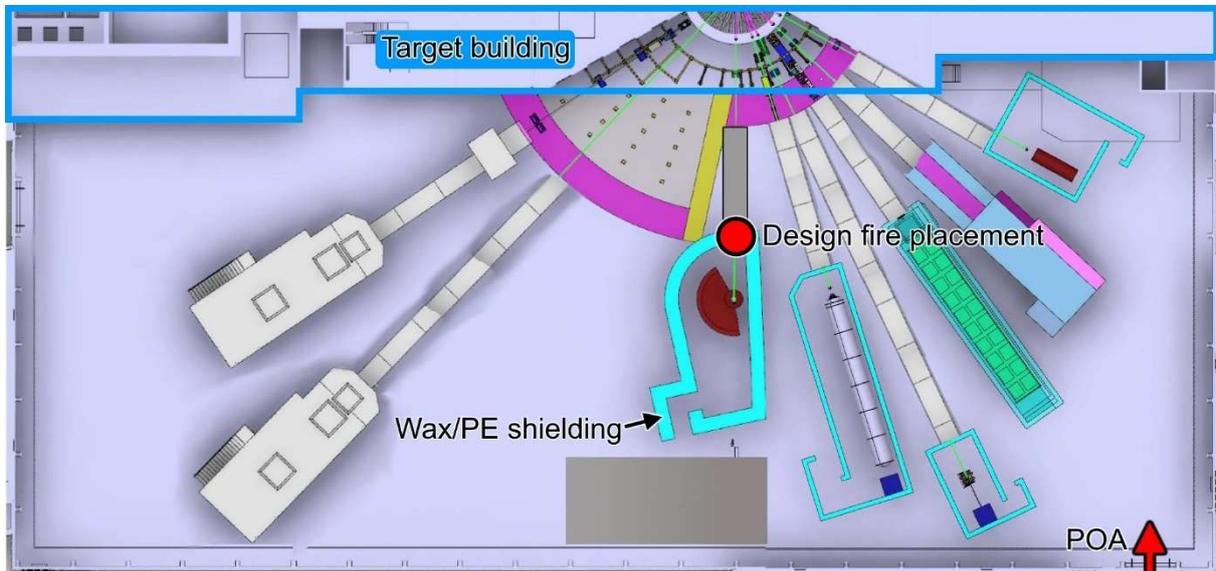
Preliminary construction sketch of the Instrument Hall with the instrument caves. Placement of the design fire and closest point of access, POA, are marked. (Used with permission from the European Spallation Source ERIC)
